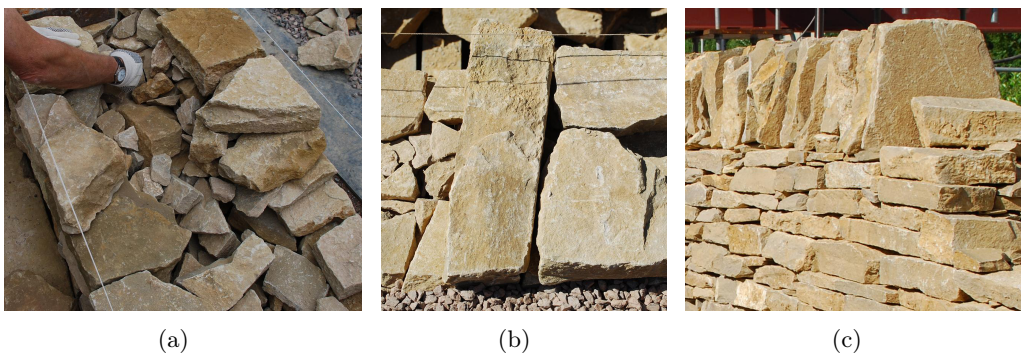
Internal wall configuration: a) face and fill; b) tie stones; c) coping stones
